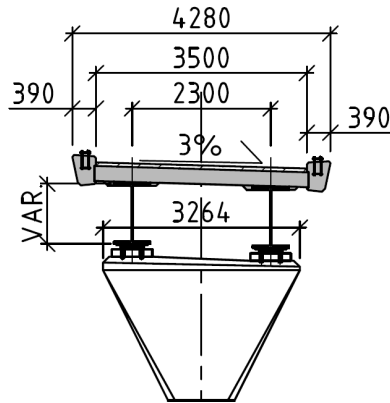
Cross section of concrete deck and steel beams on arbitrary column, Bårdshaug Bridge, dimensions in mm. From internal documents at Statens Vegvesen.
